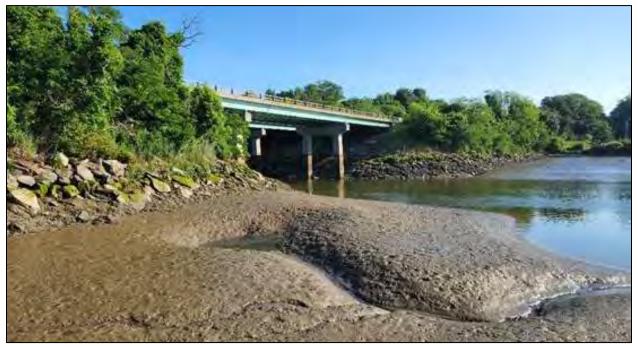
View from Yarmouth Boat Yard boat launch, facing north toward I-295 bridge.
